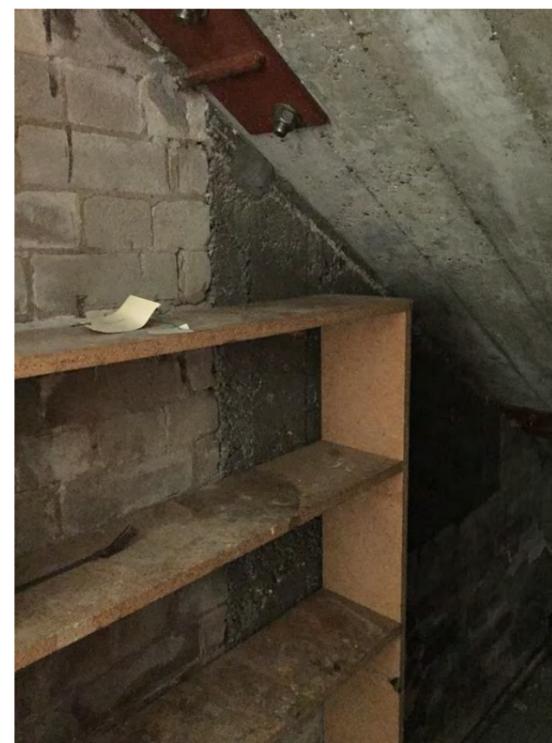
Concrete Masonry Brickwork with RC window infill and RC stairs tied into West side wall.
